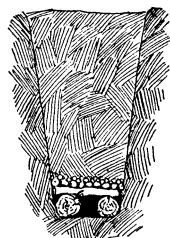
Subdrain constructed of logs and fagots of wood.
